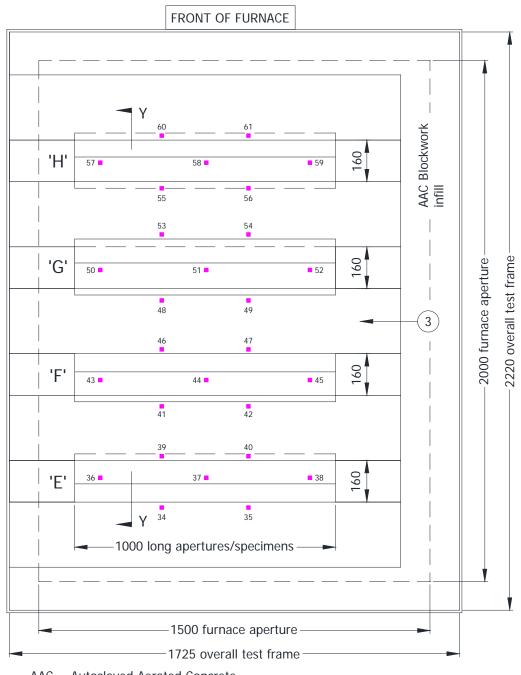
General plan of floor specimens 'E' and 'H' and unexposed face thermocouples
